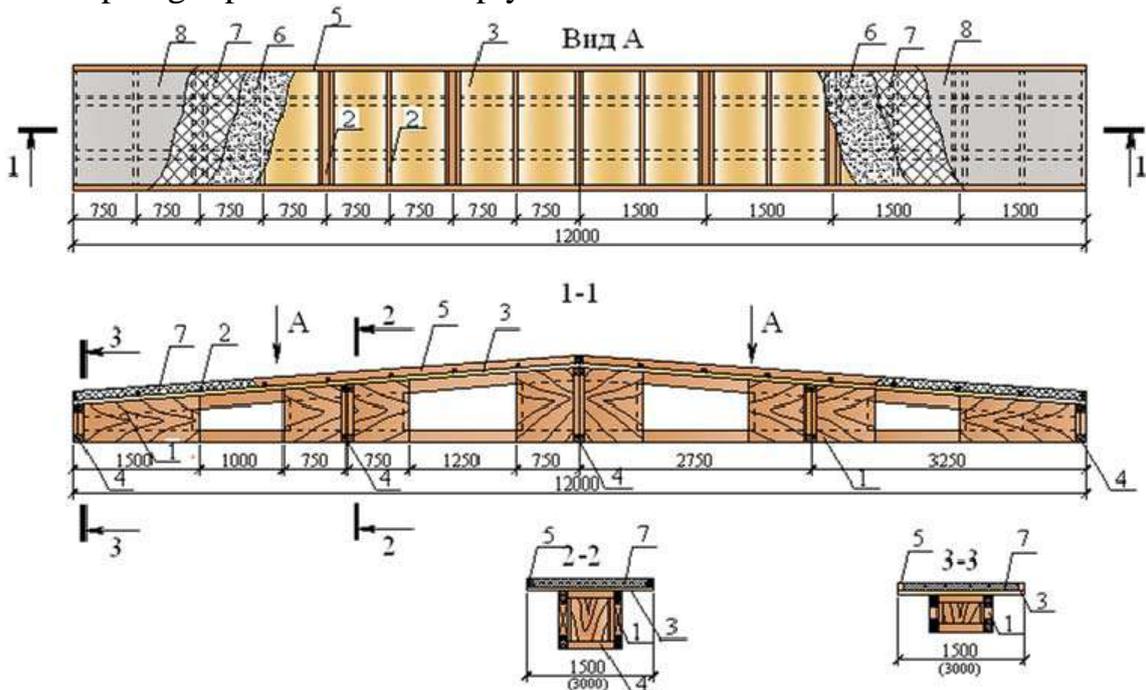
The slab with adhesive plywood ribs: 1 – main ribs, 2 – auxiliary ribs, 3 – coating, 4 – apertures, 5 – frame ribs, 6 – vapour sealing, 7 – warmth-keeping jacket, 8 – ruberoid mat
